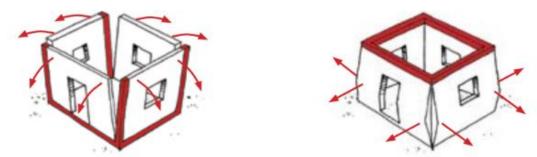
Walls of a simple building are not prevented from falling by columns alone. Roof-level ring or tie beams can tie the building together. (From Guide book for building earthquake resistant houses in confined masonry (World Housing Encyclopedia, 2018).
